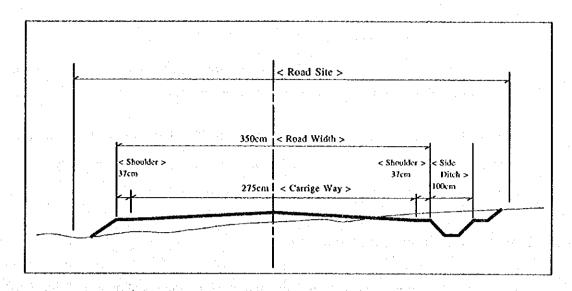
Standard Cross-Section for Forest Road Earthwork
